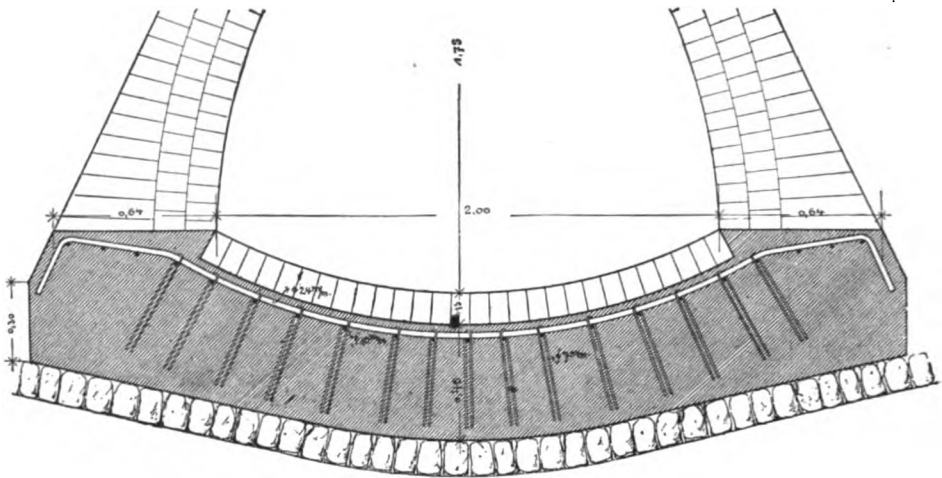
Reinforced concrete sewer base in Wiesbaden.
